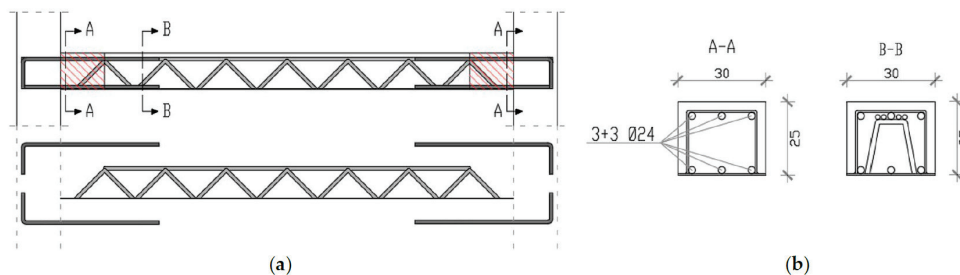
Ductile beam–column connections between composite reinforced concrete truss beams and RC/CFT columns: (a) longitudinal section and (b) cross-sections A-A and B-B (adapted from Di Cesare et al. et al. (2023) [70] and <https://www.metalri.it/en/>).
